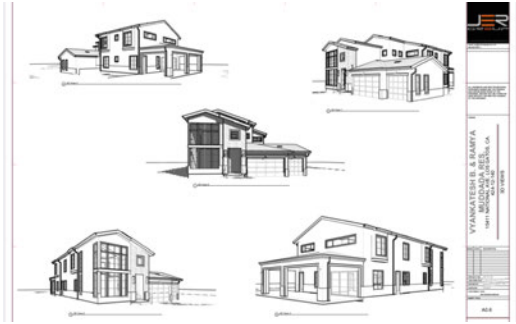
3D views of the proposed house (NNW-facing side not shown)
